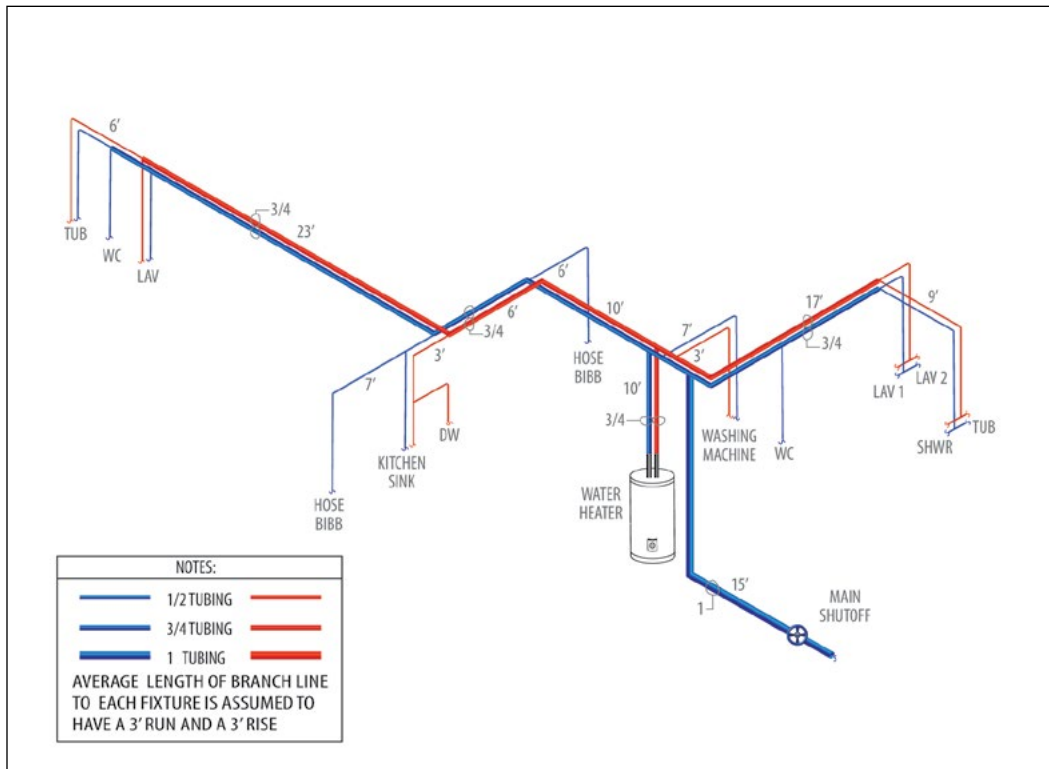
Trunk and Branch Isometric Riser for the Ranch House
